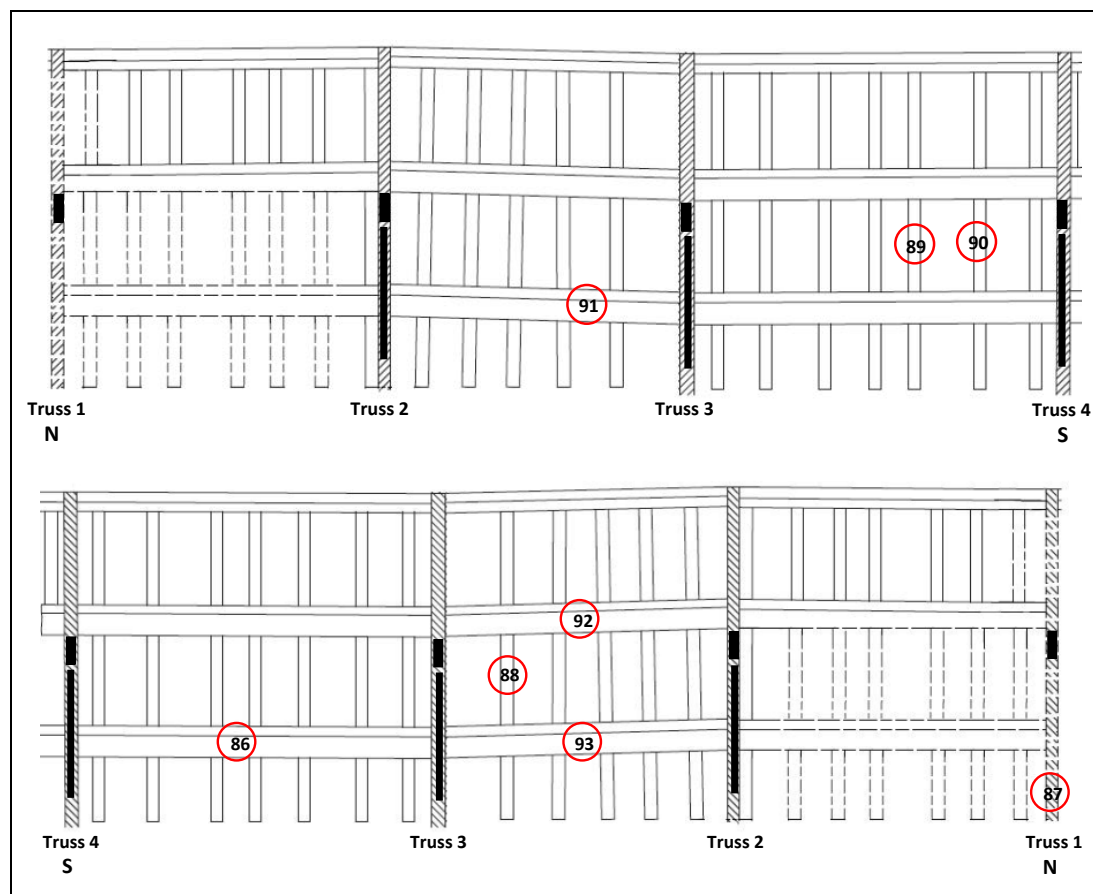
9a The Close (roof 1); long-sections through upper parts of trusses 1-4 showing sample locations (after John Allan, Exeter Archaeology)
